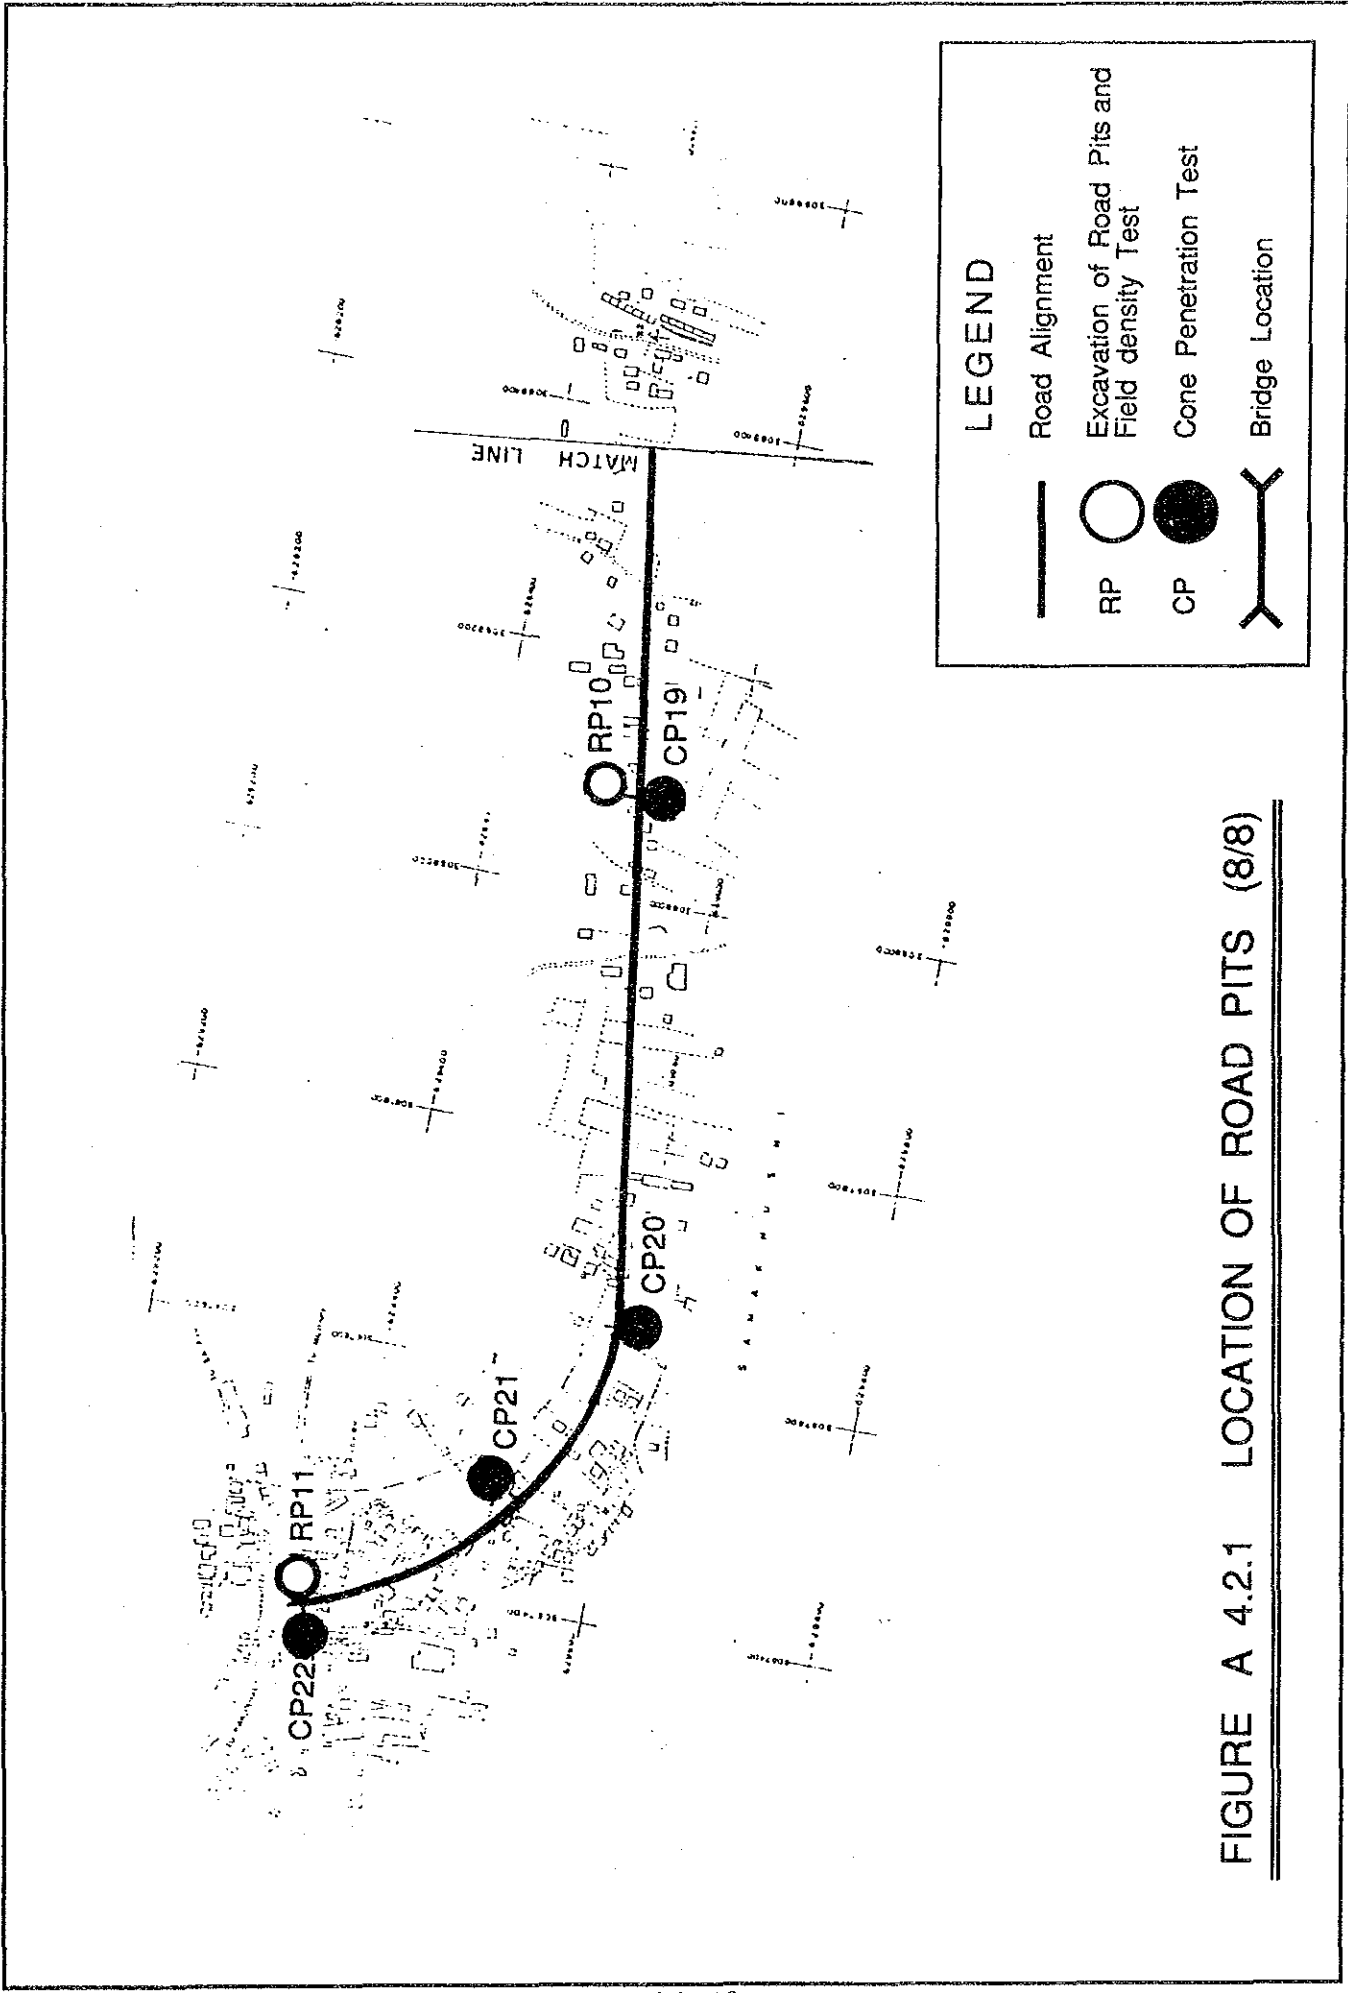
LOCATION OF ROAD PITS (8/8)
